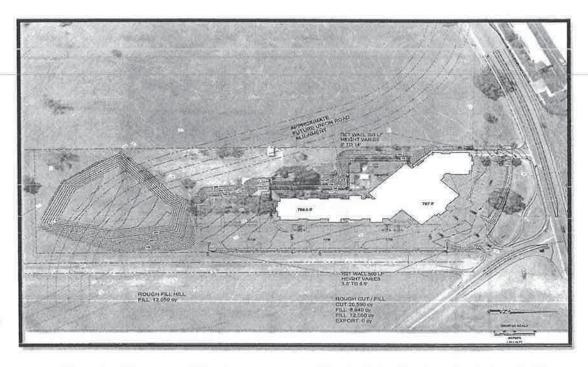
Site plan and development proposal for the Union Road project in Paso Robles.
